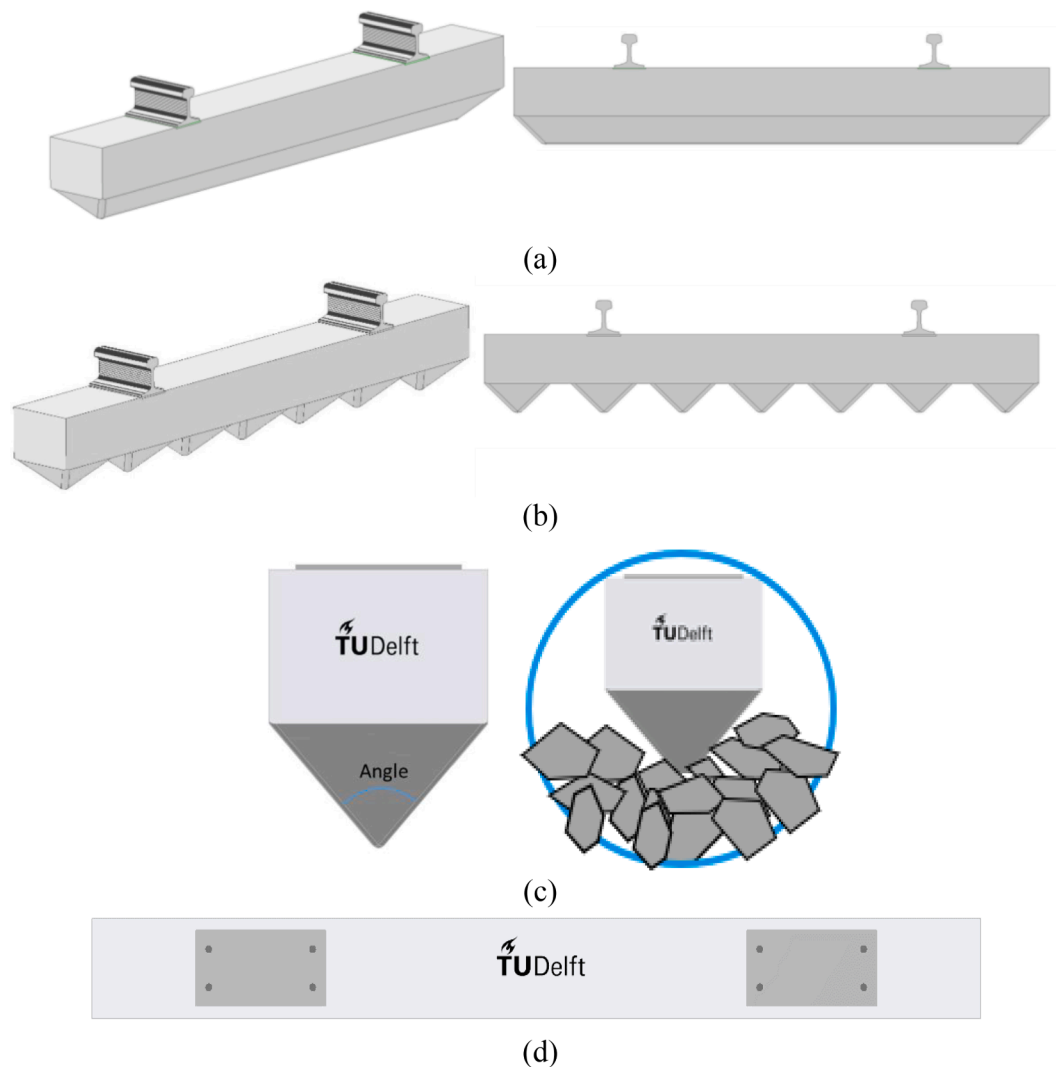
Wedge-sleeper designs. (a) Single wedge design, (b) Multi-wedge design, (c) Side-view of both designs, (d) Top-view of both designs.
